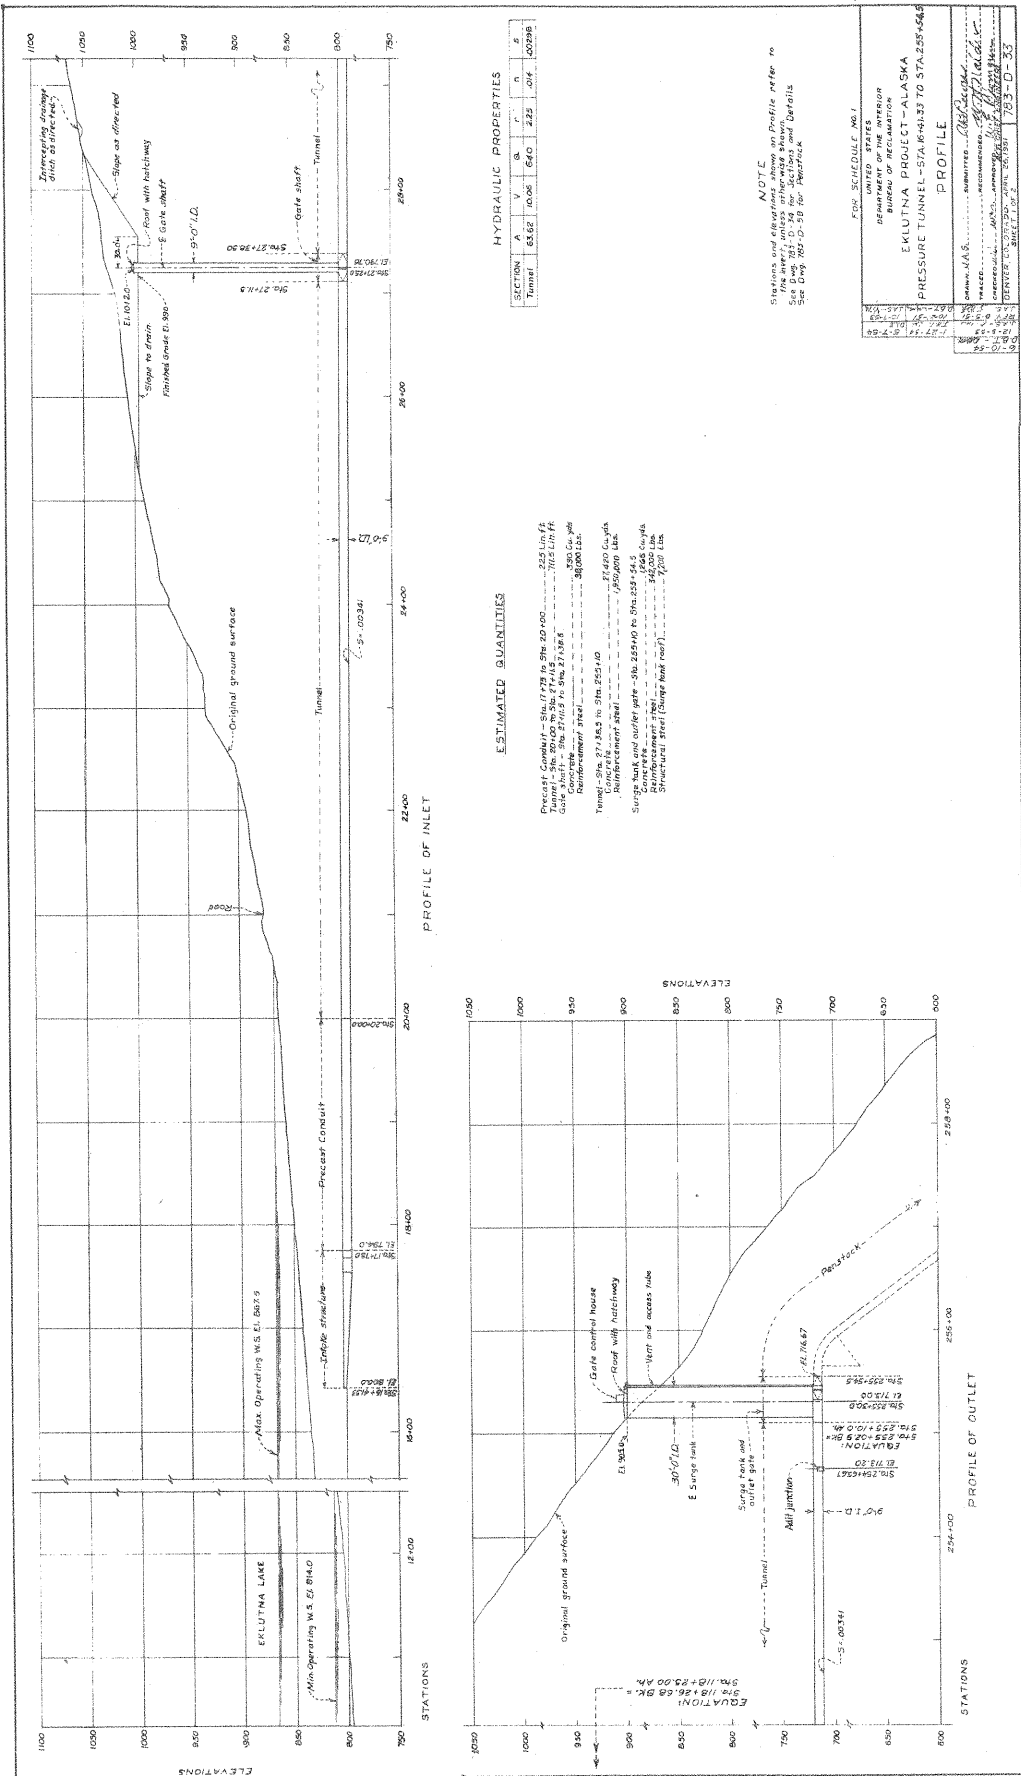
Profile of pressure tunnel from station 16+41.33 to station 25+54.5.
